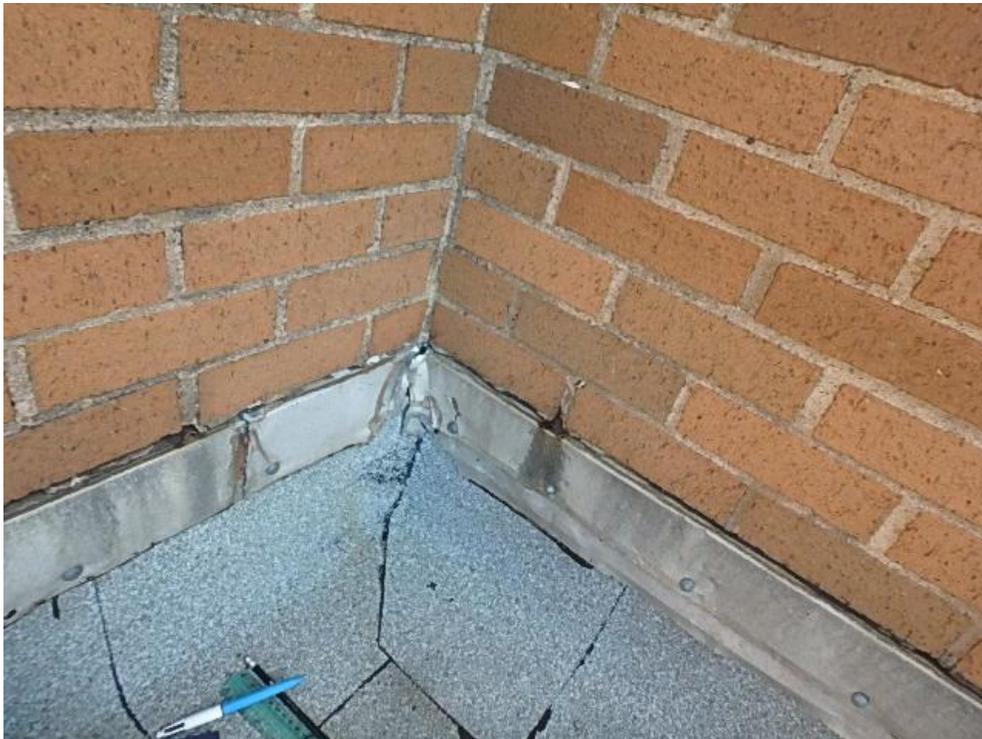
Roof Area 2.3 – Parapet intersection at wall and reglet detail. Improperly sealed reglet over parapet.
